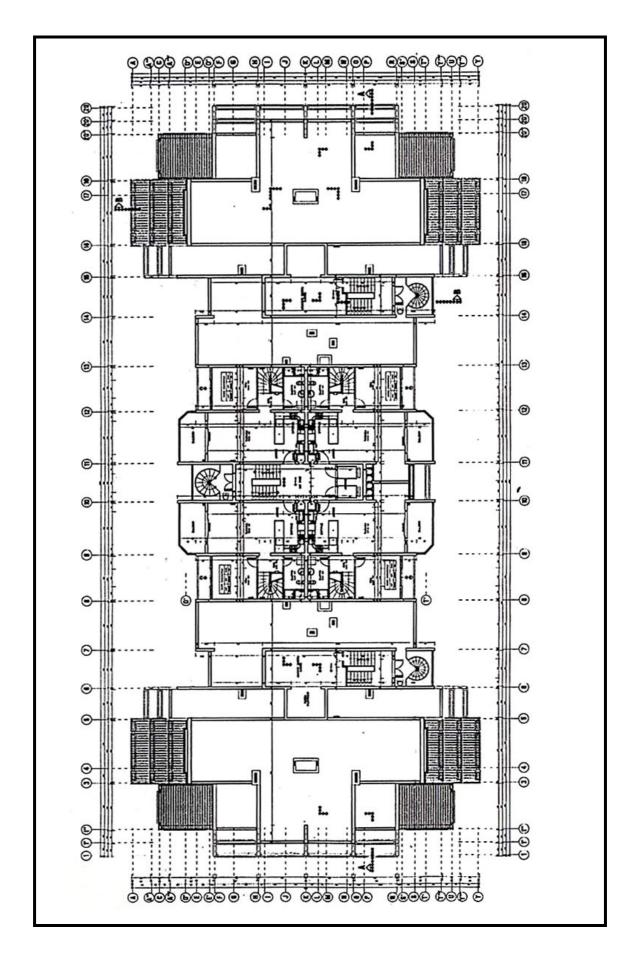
Mavişehir II; Kuğu 21st-Floor Plan
